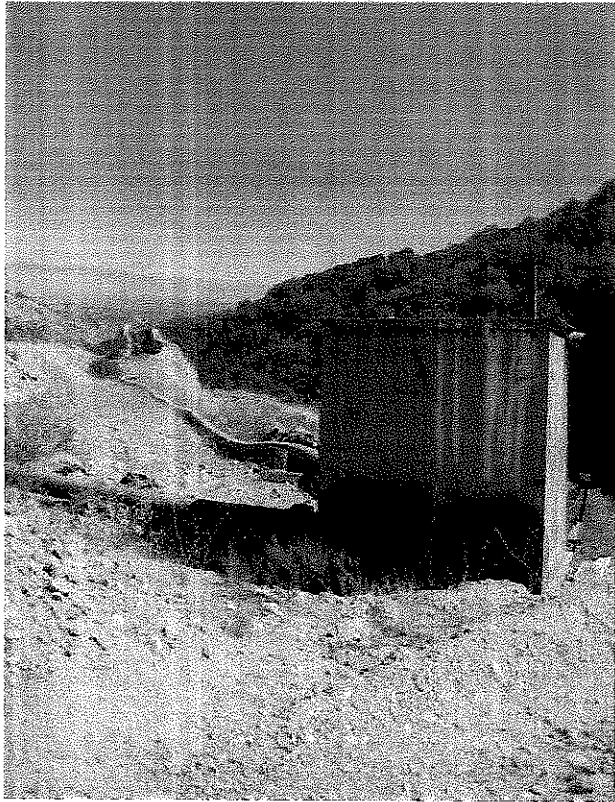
View of piping diverting water from the quarry pit to Pond 4 in the distance.
